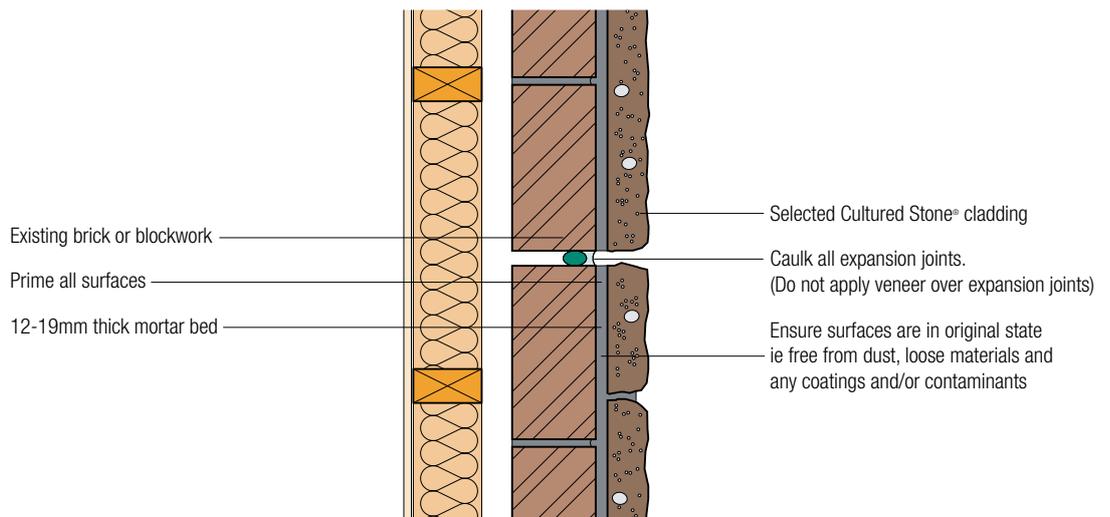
Brick or Block Work Veneer - Plan (Dwg # CS-03.02)
